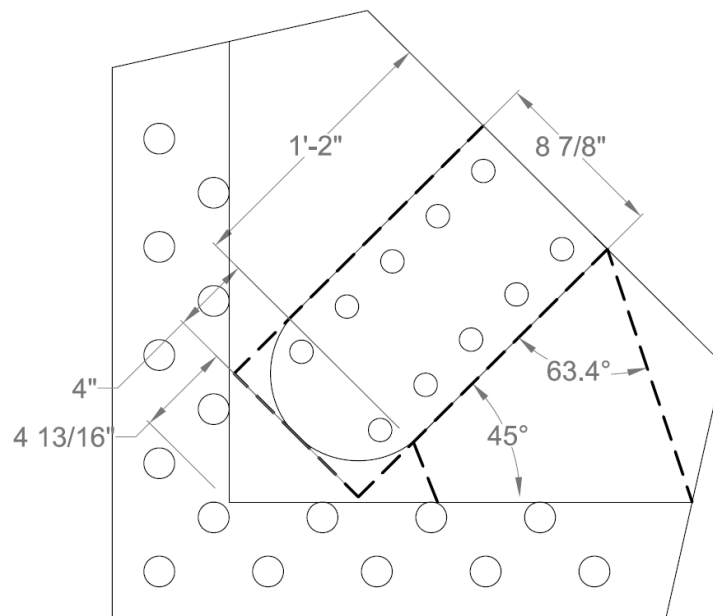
Gusset Plate Dimensions for GRS Calculation, Specimen 4
